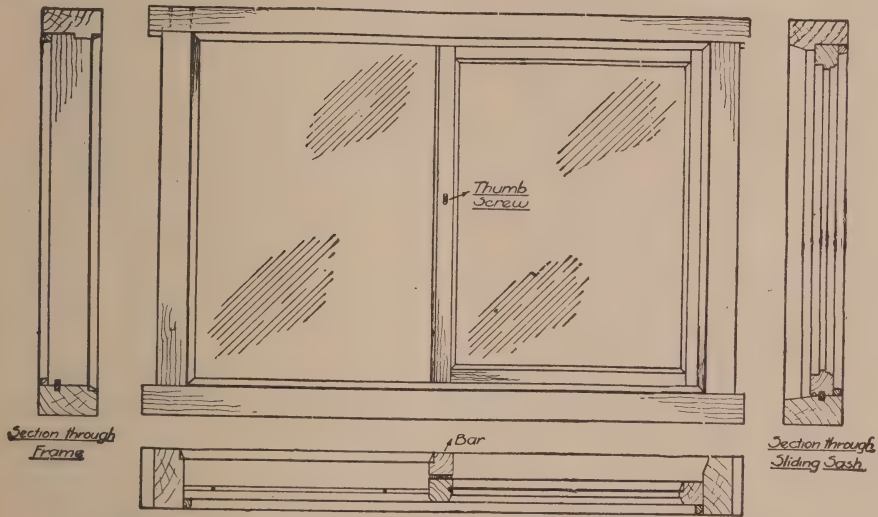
Two Sections, Elevation and Plan of Yorkshire Lights
